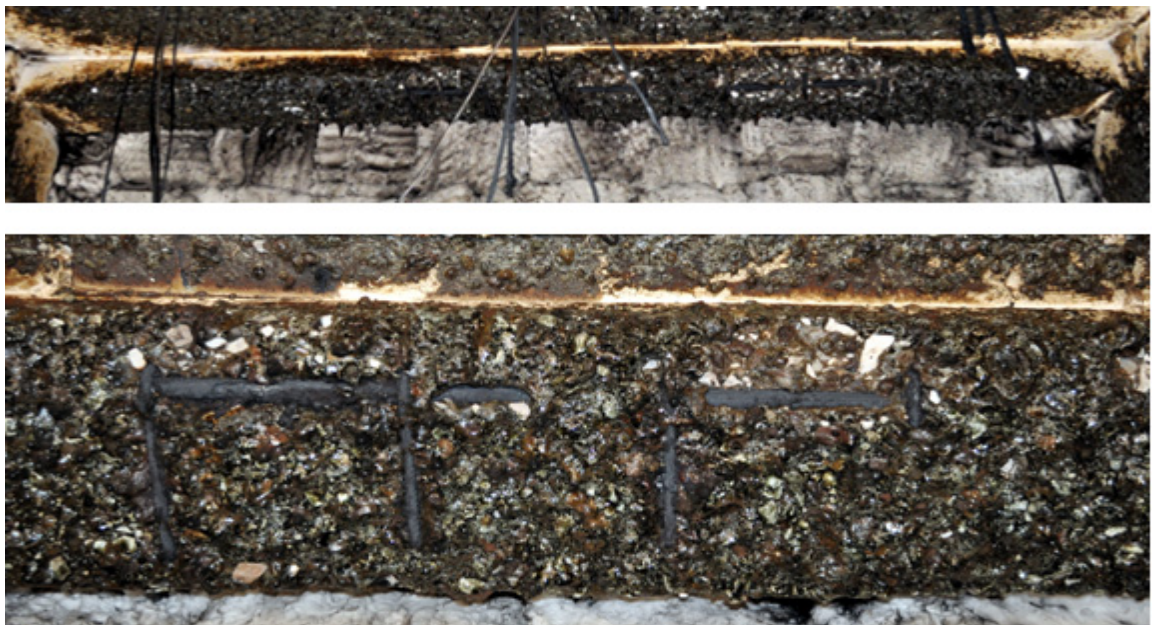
A view of Beam B8 showing sintering and spalling of concrete along the length of the beam
